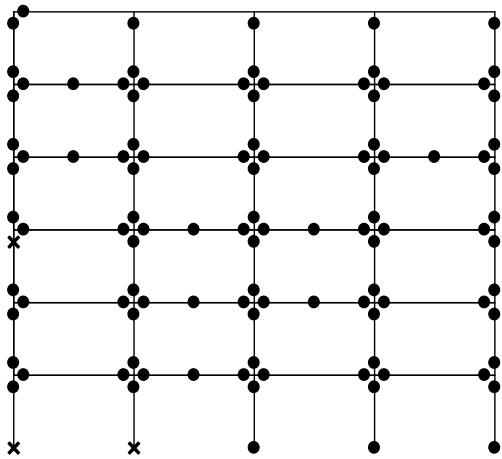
Damage to Frame 6 (SMA at the ends of the first floor beams)
